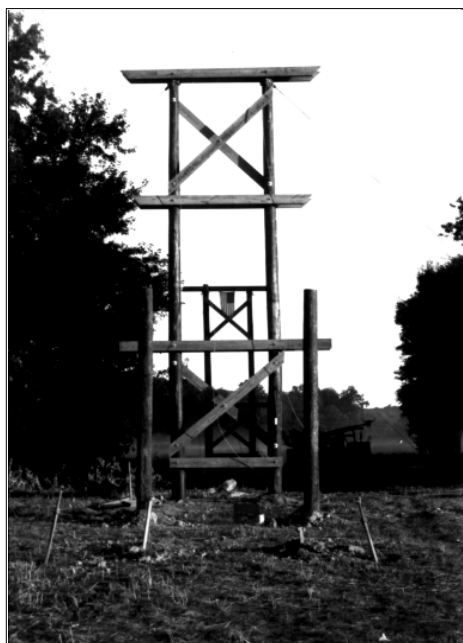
View looking through the east tower at west tower before foundation excavation. Photo courtesy of Mr. Tibor Latincsecs.
